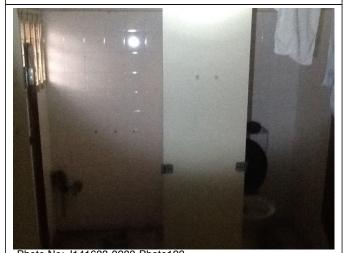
Photo123 Result: Asbestos - Previously Sampled Positive Building/Level: Building 1-Basement Level Room/Location: 1R9016-Toilet-North Feature/Material: Cubicle Partitions-Compressed Cement Sheet
